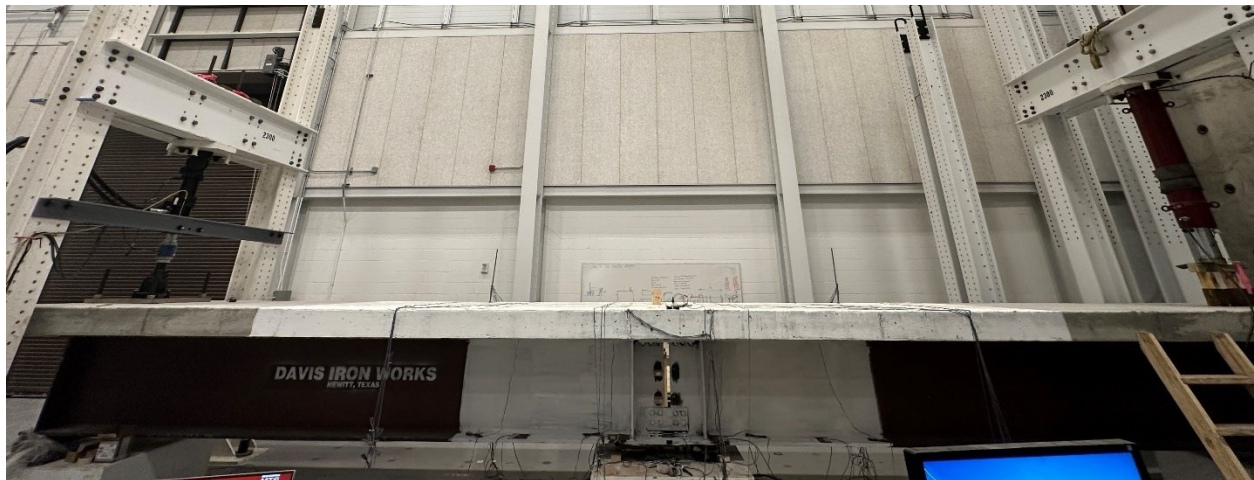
Overall Elevation View of Concept A Test Setup.
